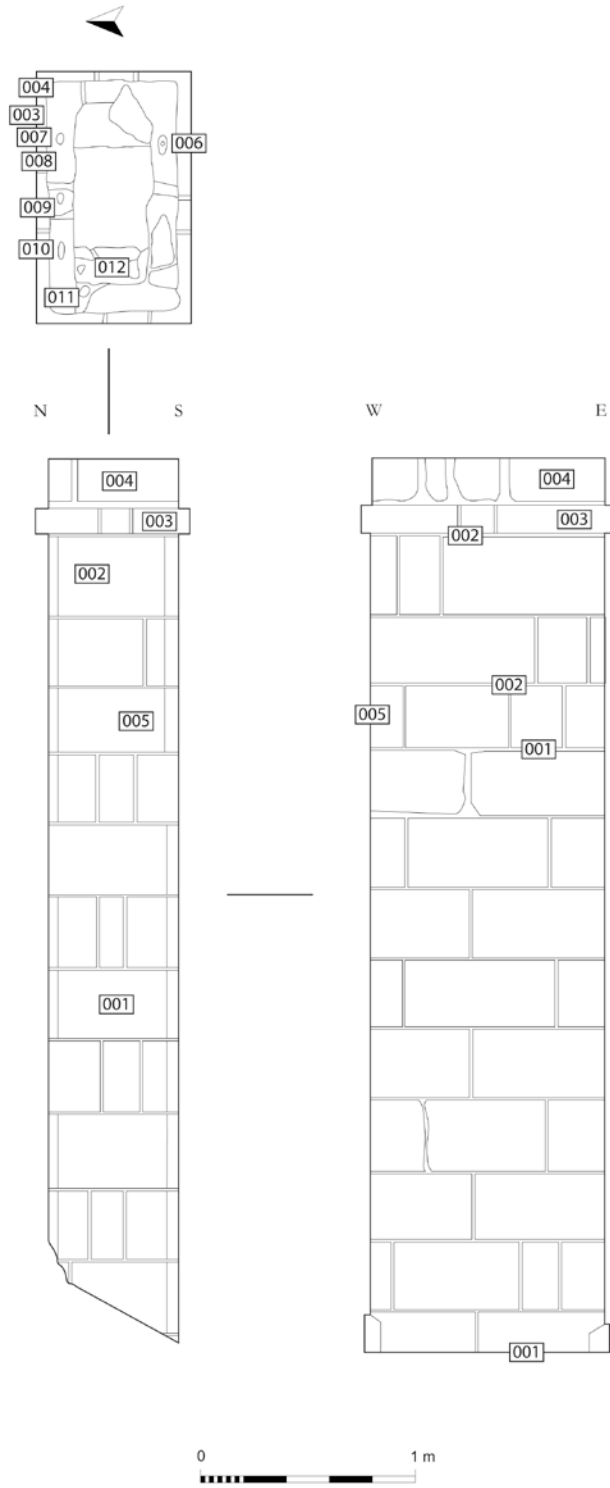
Chimney RC02, plan (top), western elevation (left), and southern elevation.
